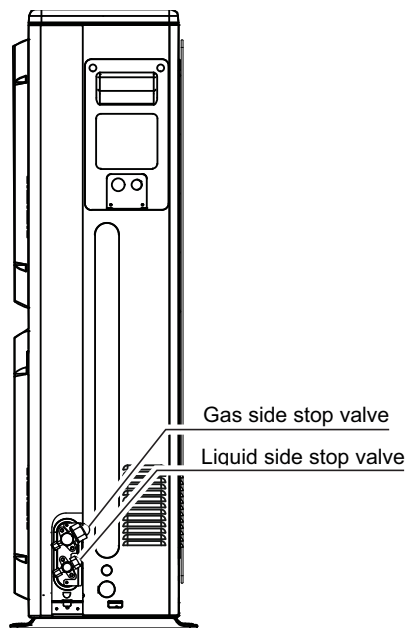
Connection of Flaring (4.0/5.0 ton) - Side View
